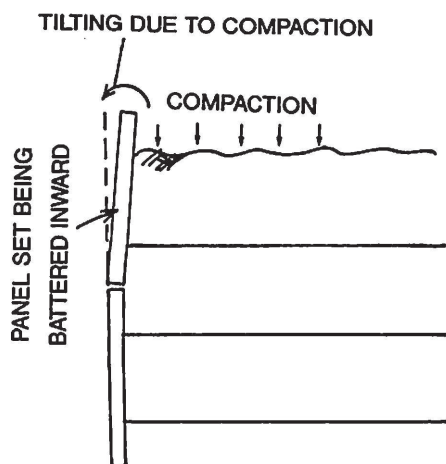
Schematic diagram showing complicated arrangements to ensure wall facing alignment for Terre Armee wall.
